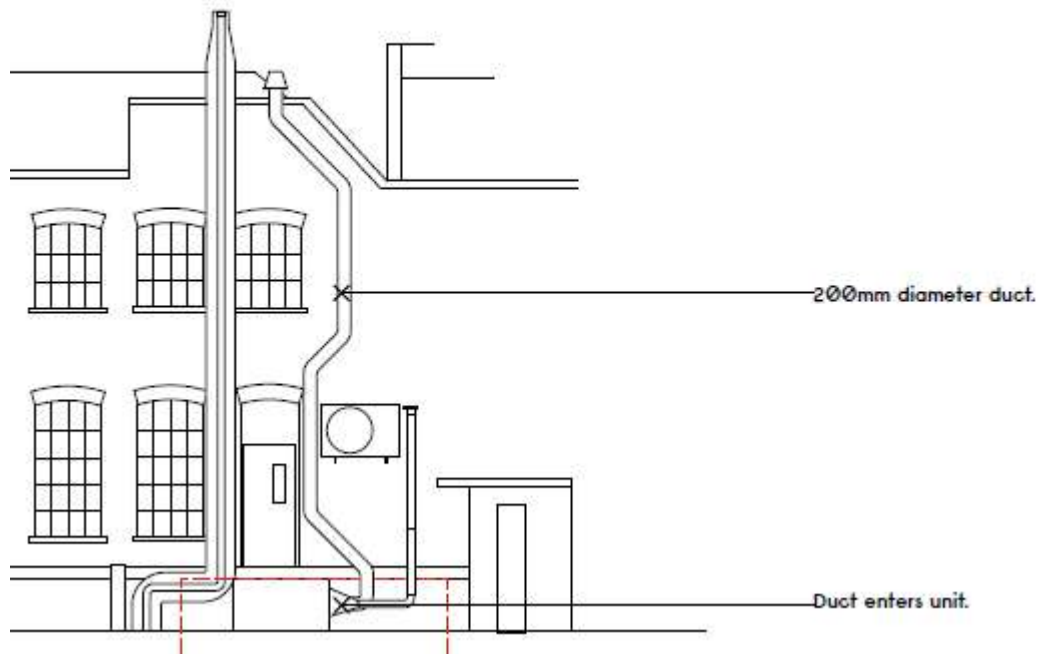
Not to scale extract from the Proposed Elevation showing the new ductwork
